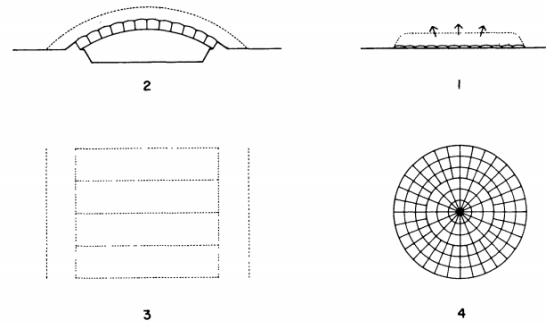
Base concept, low arch shield with pneumatic support structure (Land 1985, courtesy of NASA). (1) Deflated structure flat structure flat on ground. (2) Structure inflated, raising the regolith. (3) Plan showing the concept applied in sections for a continuous low arch shield. (4) Plan showing concept applied in a low, domed shield.
